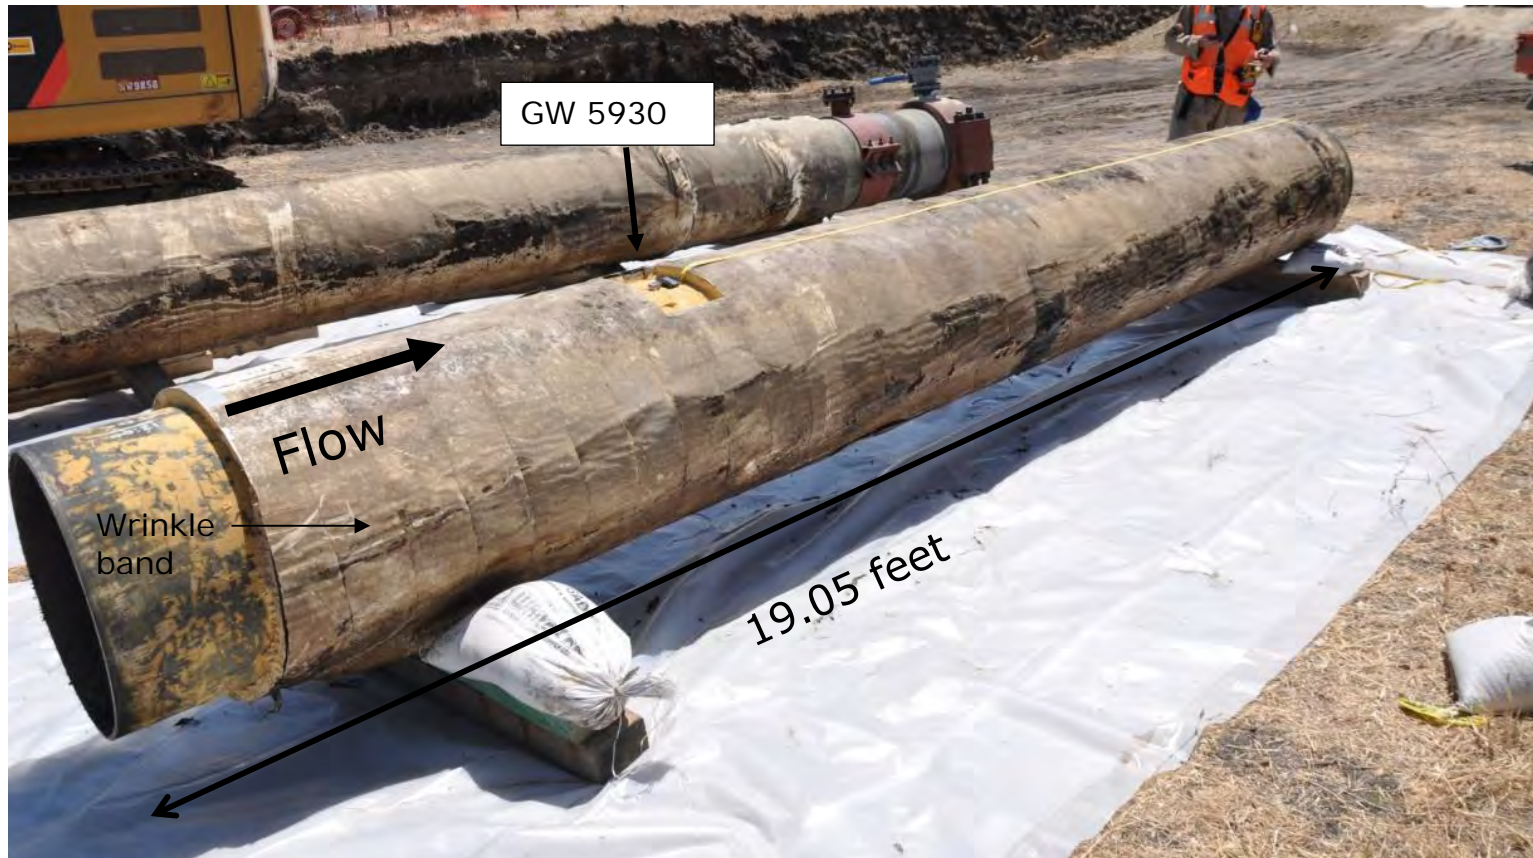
Photograph showing Pipe Section 1 following removal from the ditch.
